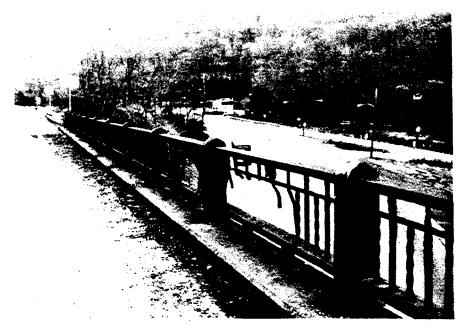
Damaged Steel Post Bridge Railing
